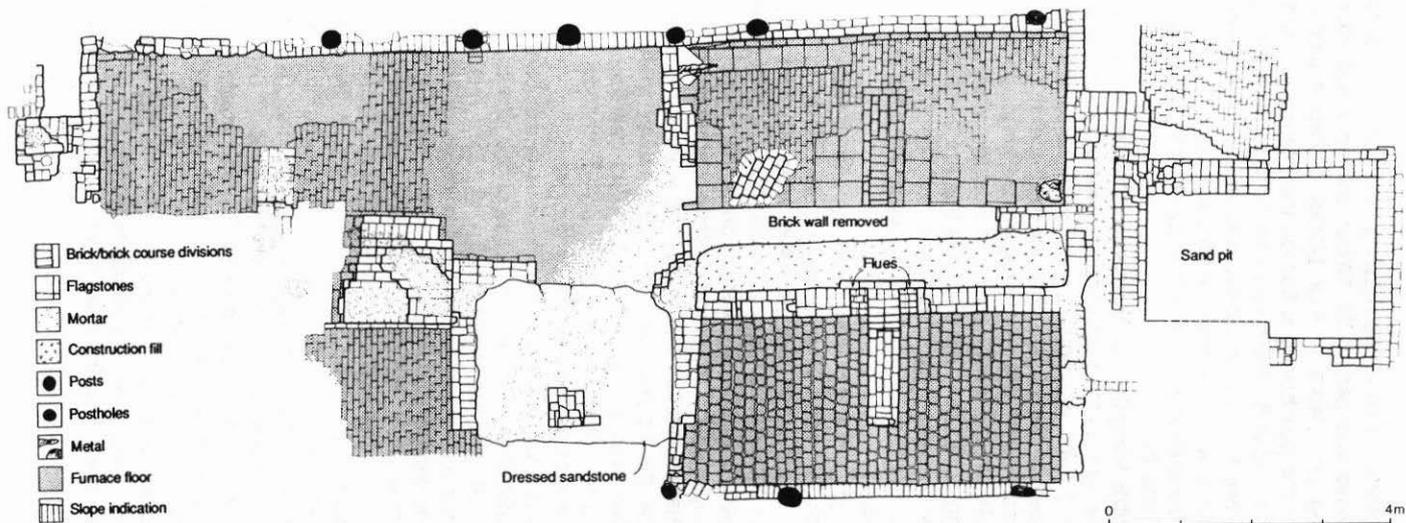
Plan of the remains of the roasting installation excavated in 1991 (north at right).
